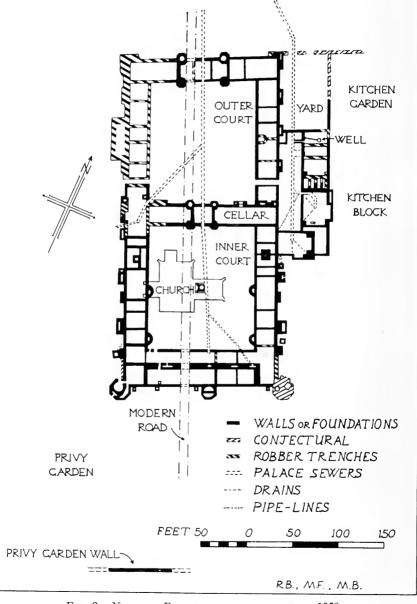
Nonsuch Palace, plan as excavated 1959.
